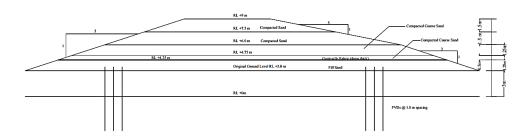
Typical Section of an embankment section of the Mirasarai, Chittagong superdyke project.
